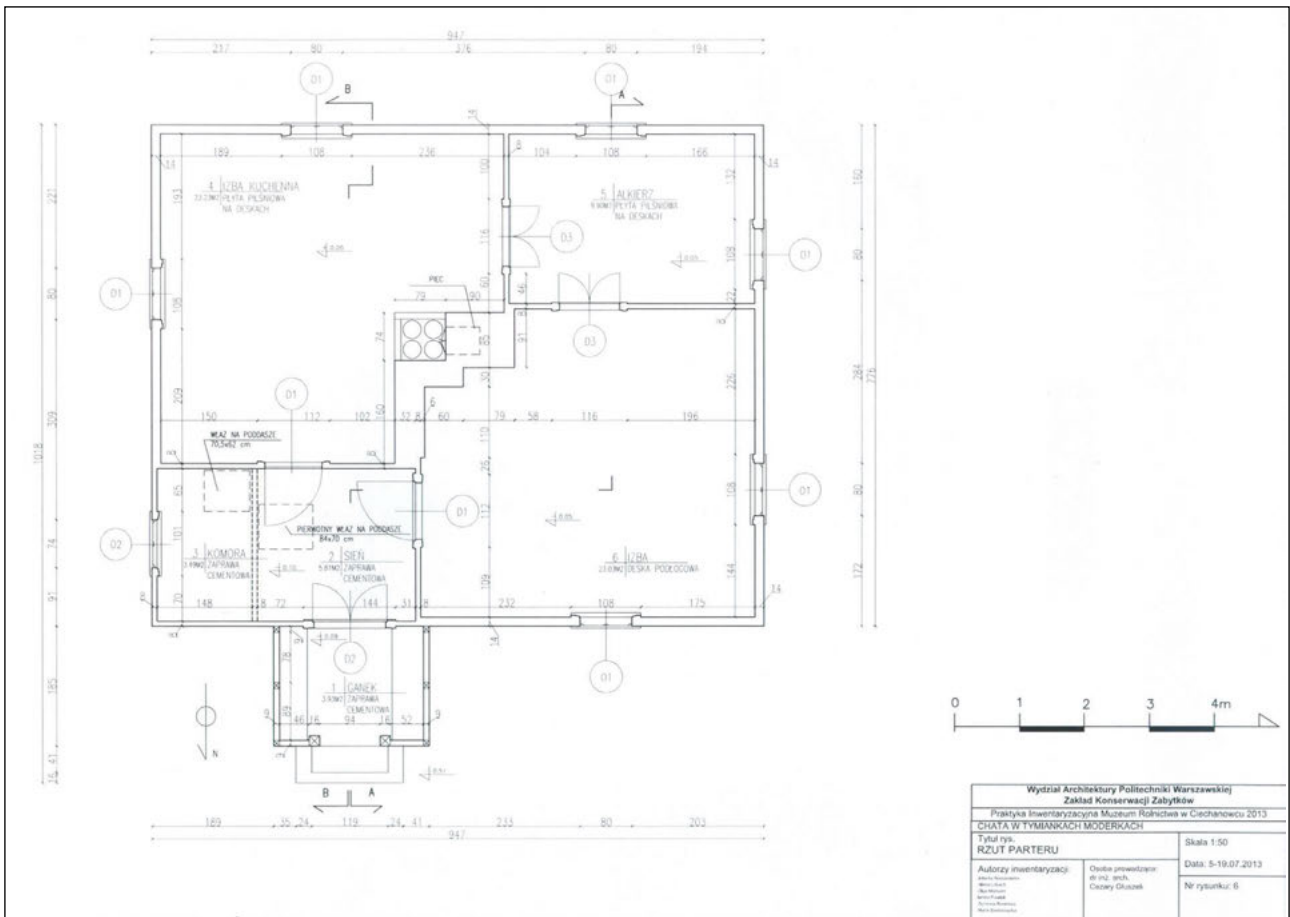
Cottage in Tymianki Moderki. Ground floor plan, DWG, 2013.
